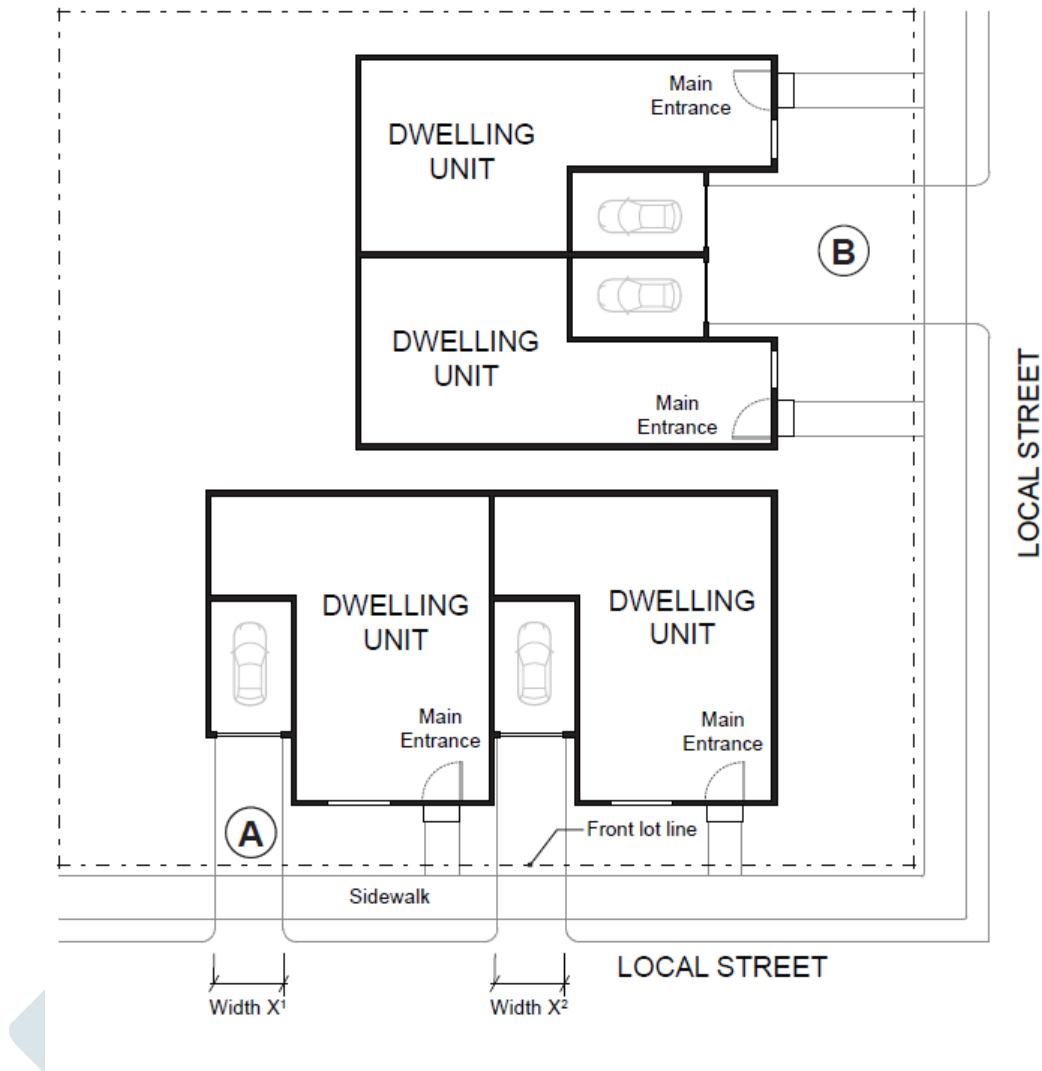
Driveway Approach Options for Multiple Local Street Frontages
